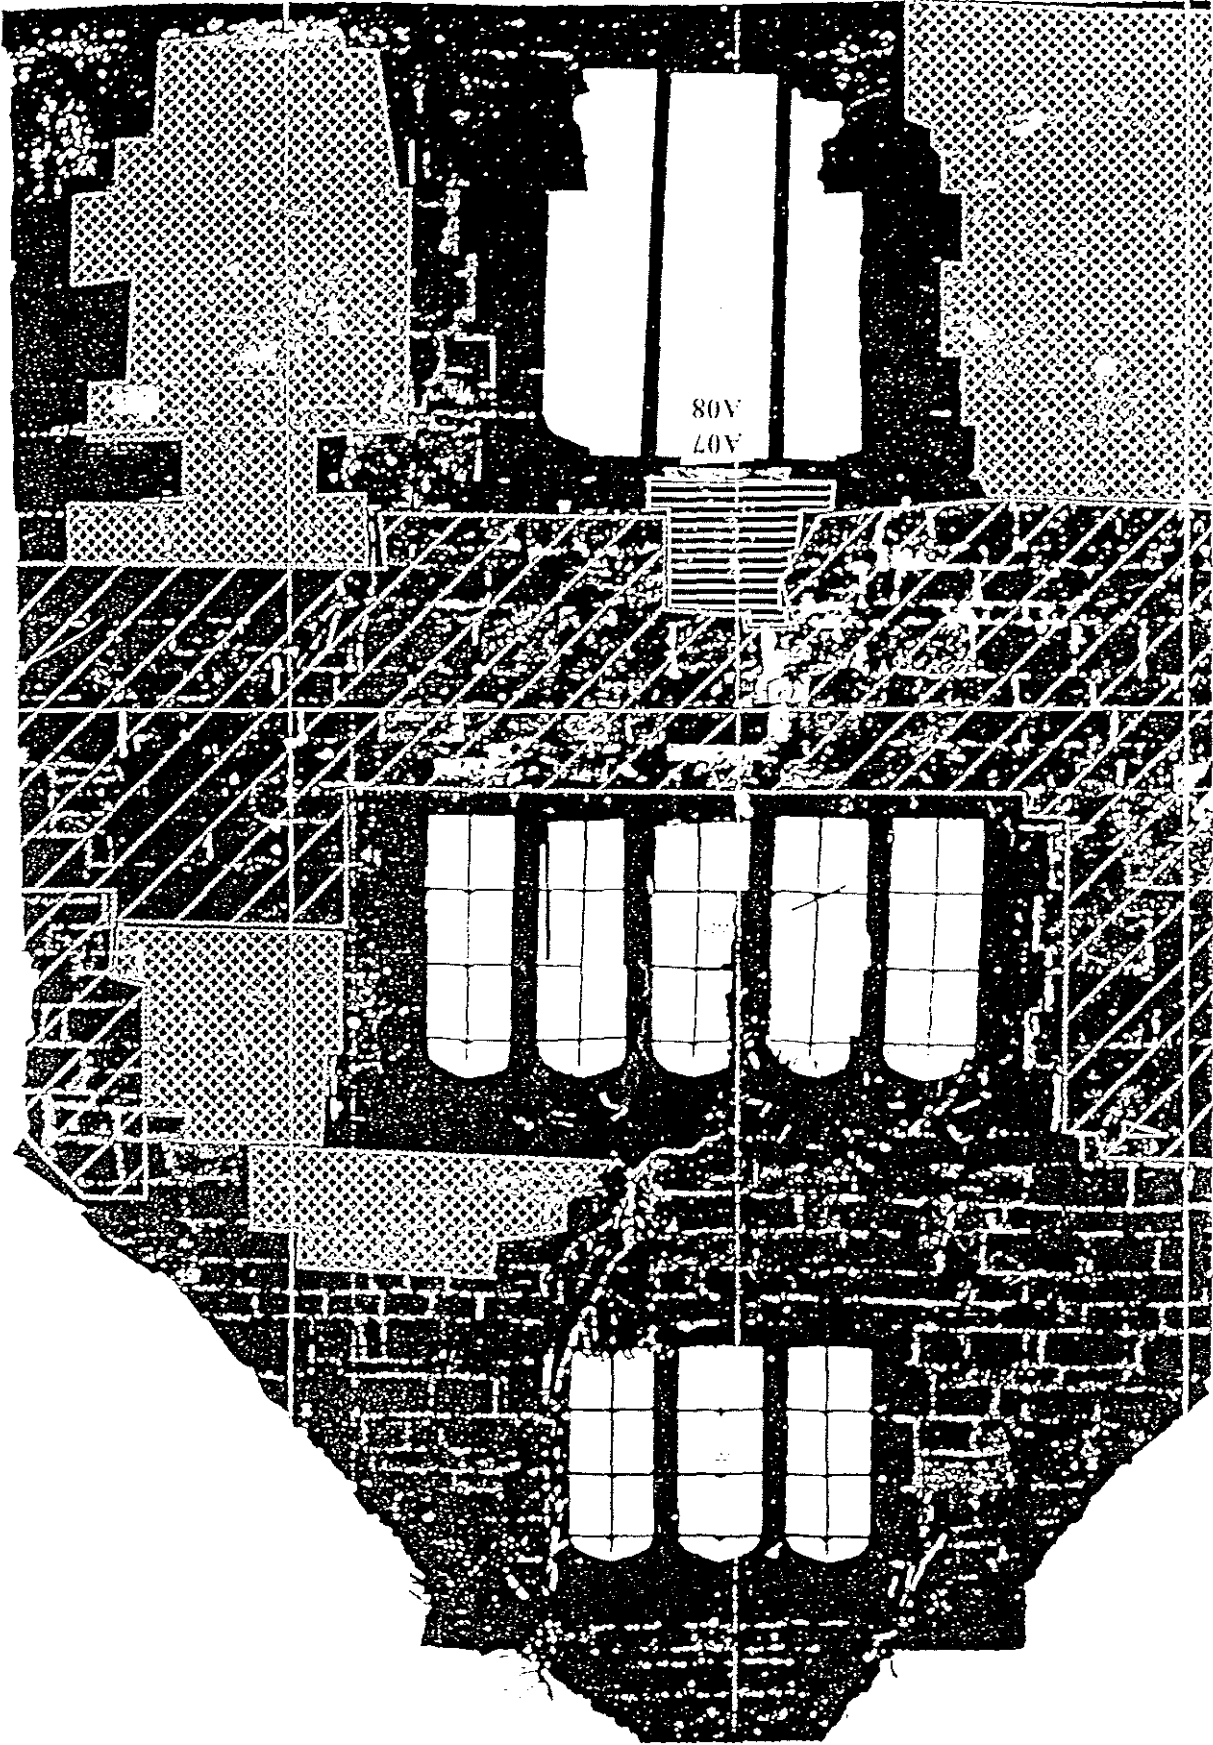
Drawing to show positions of samples FAW-A07 and FAW-A08 from window 22 in the south wall
